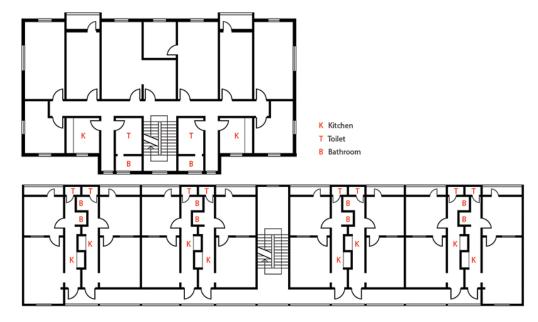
The plans of the collective apartment. (Top) apartment plan during the 1960s with sharing amenity area and (Below) building during the 1970s with private amenity area (Tran & Dalolm, 2005)
